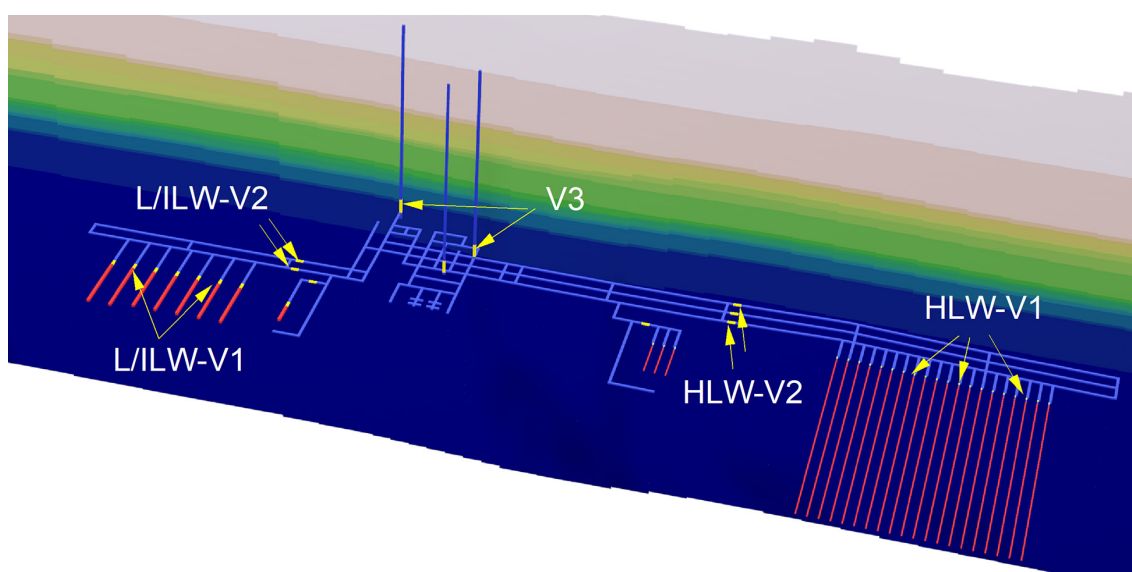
Schematic layout of the underground repository sections for HLW and L/ILW at the Haberstal site
